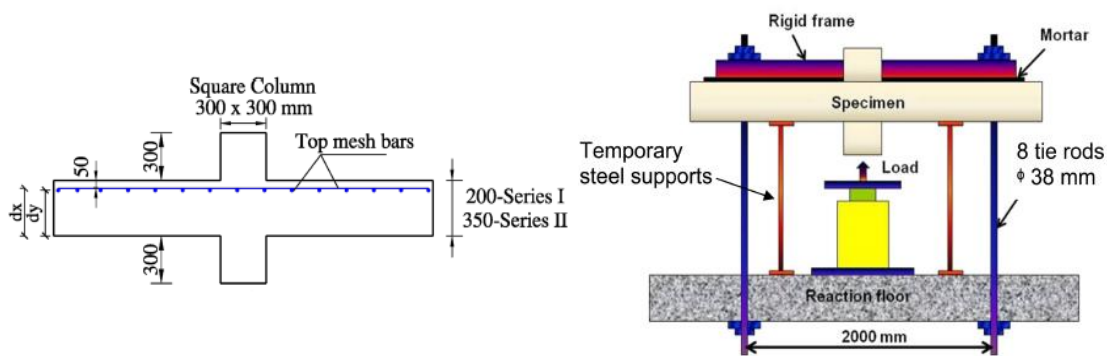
Test specimens' geometry, reinforcement configuration and test setup.
